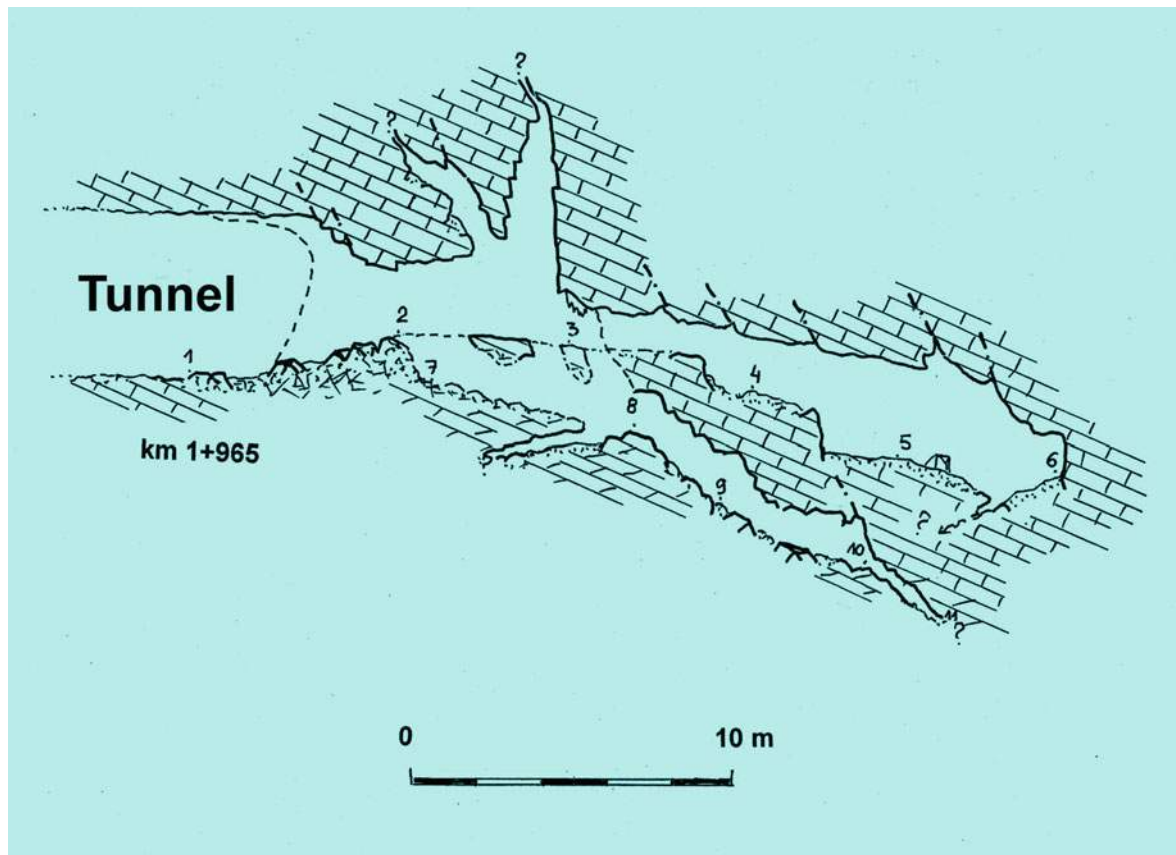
Plan of cavern at km 1 + 965 in Puljani Tunnel
